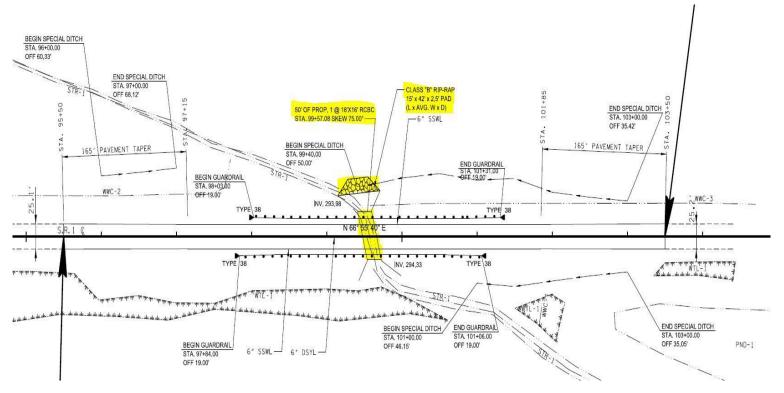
Proposed Layout of the SR-1 over Branch, LM 2.89 according to the 06/12/2019 Preliminary Plans.
